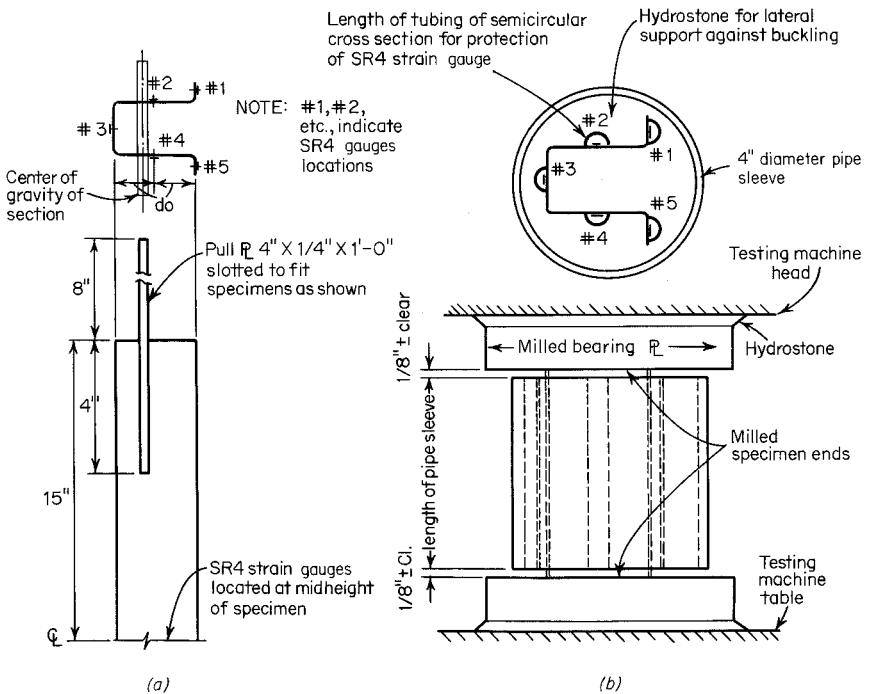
(a) Typical full-section tension specimen. (b) Full-section compression test.^{2,14}
